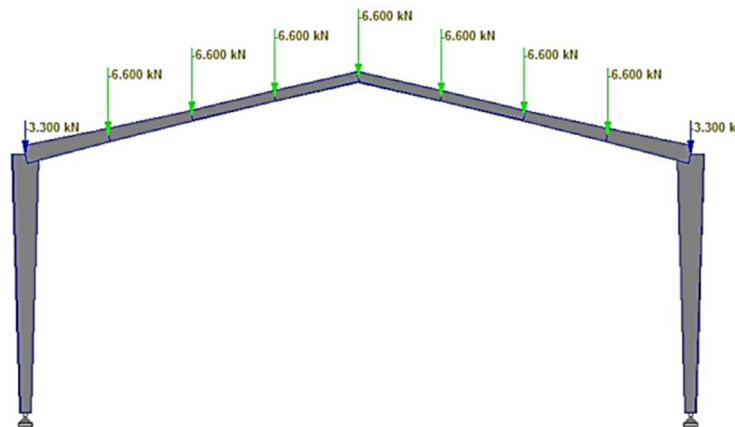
Dead loads acting at the purlin positions of pre-engineered steel frame
